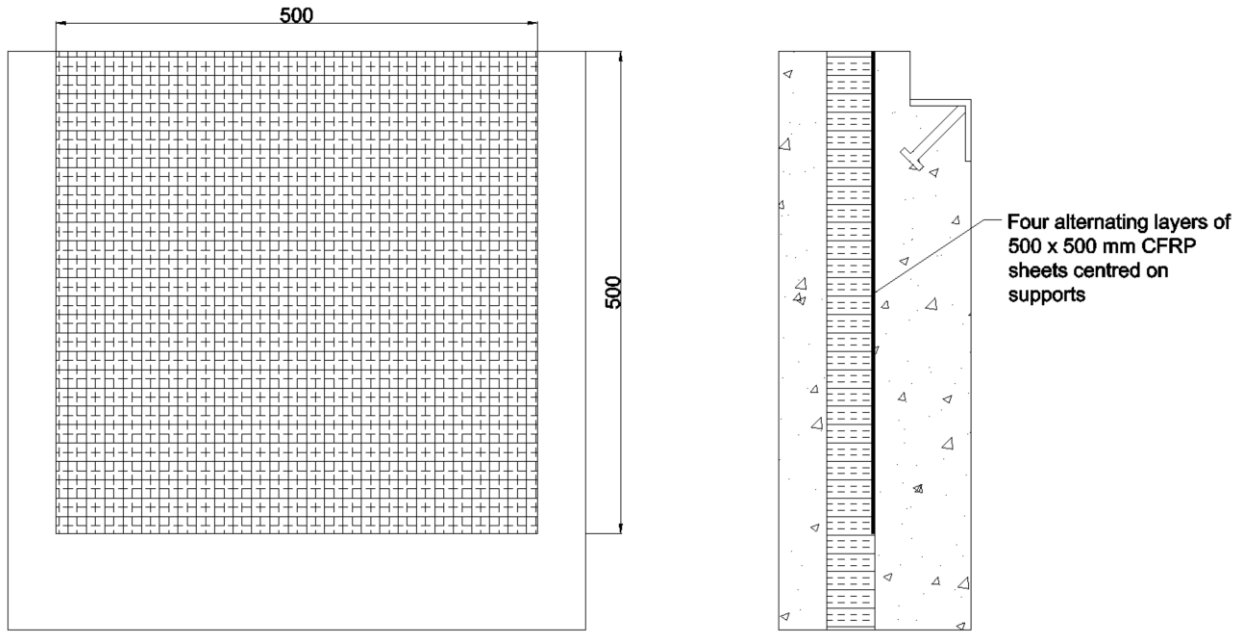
FRP Support Retrofit Details for NCTS-R
